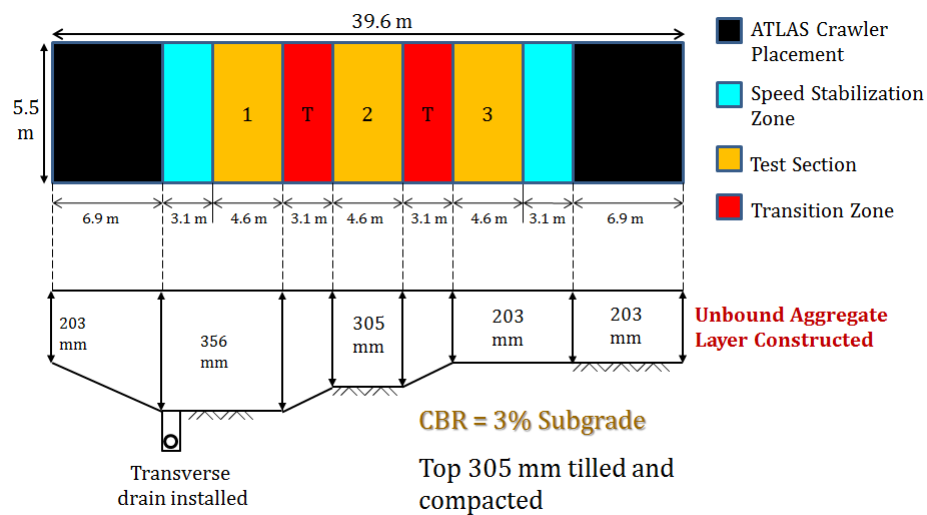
Plan View (on Top) and Cross Sectional Details of the Full-Scale Unsurfaced Pavement Test Sections
